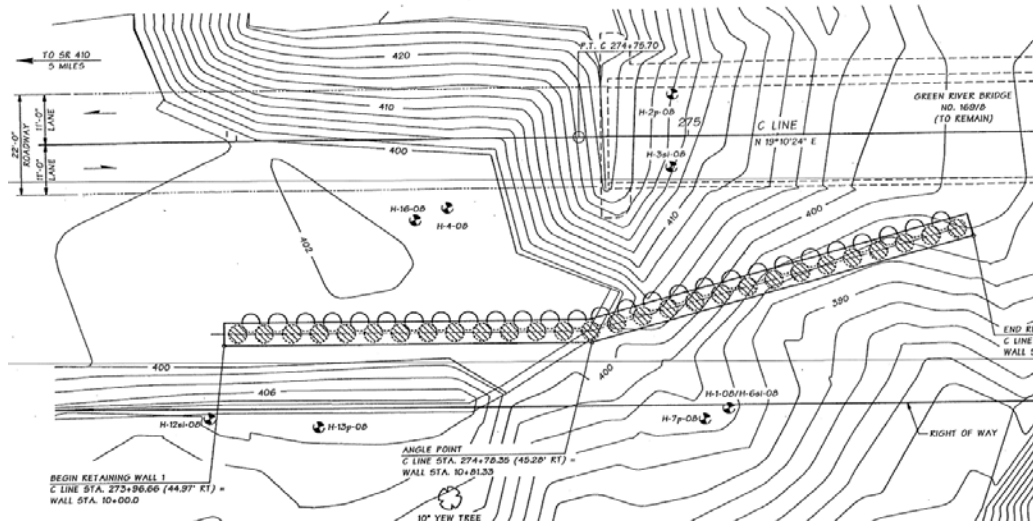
Plan view of secant tie-back wall located downslope of Pier 1.
